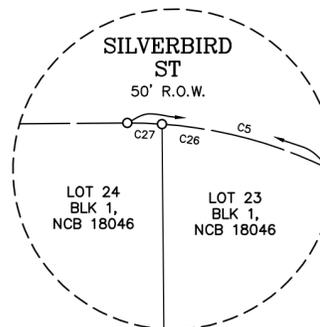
DETAIL "E" NOT TO SCALE SEE SHEET 2 OF 3
